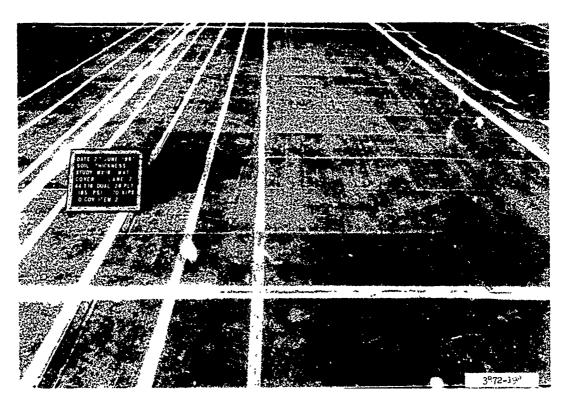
Test section II, lane 2, item 1, prior to traffic
